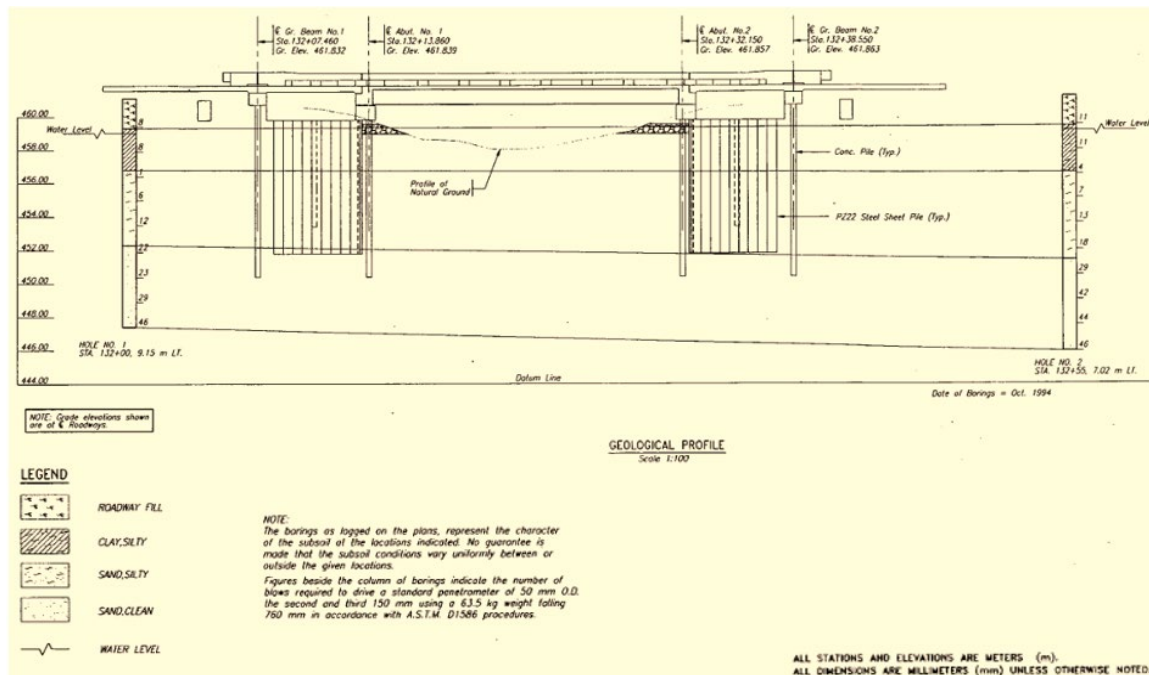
Geological profile and elevation of the bridge located in Tarnov South, Platte County, Nebraska – selected bridge site for the parametric study of the sheet pile abutment system.
